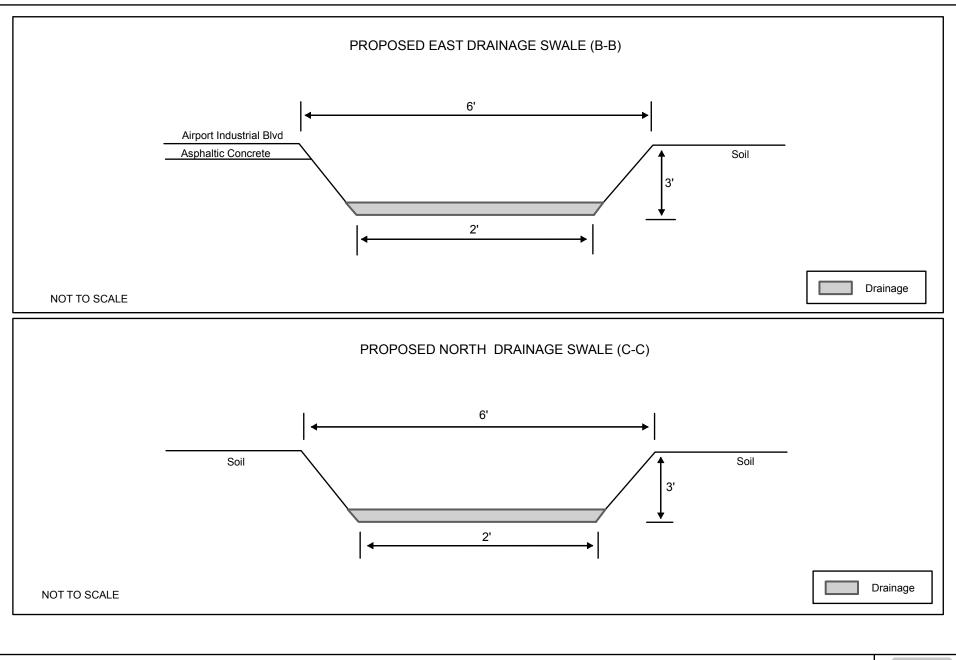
Typical Drainage Cross-Sections (B-B and C-C)
